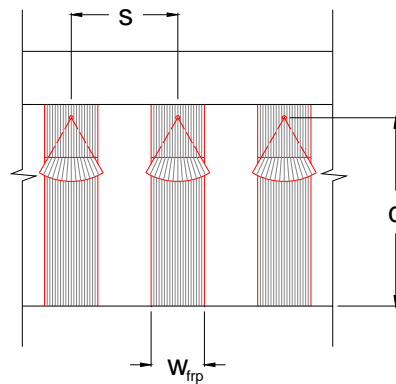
Elevation view of completed CFRP anchor installation
